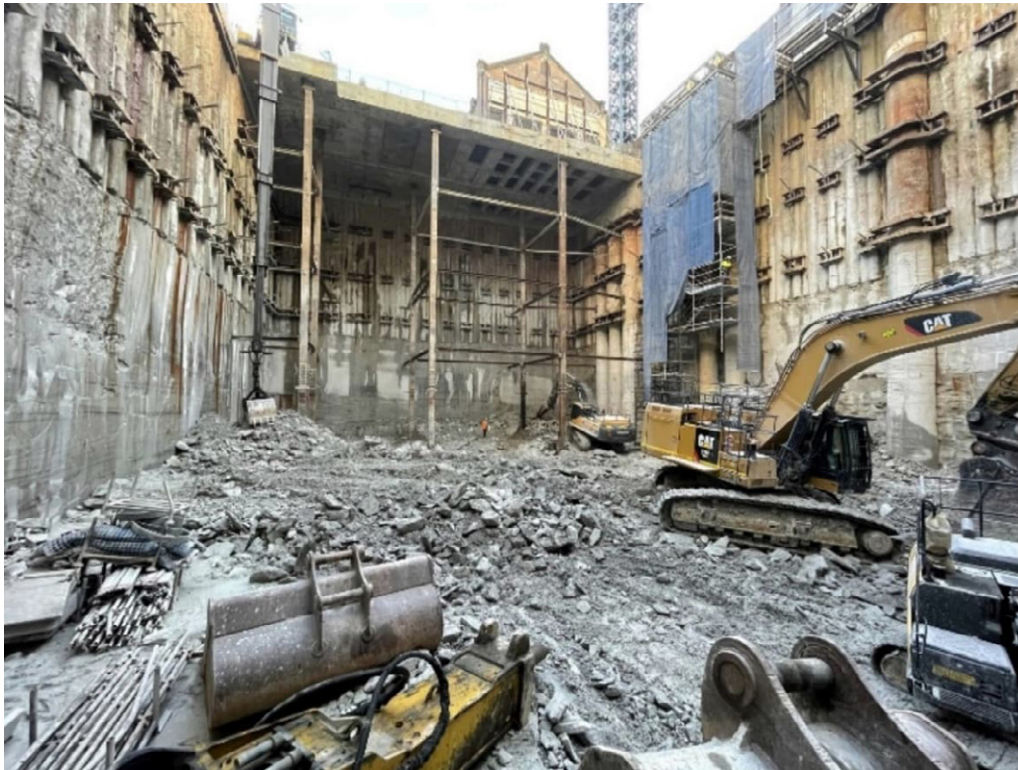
PT slab and plunge columns supporting the hall facade, looking south
